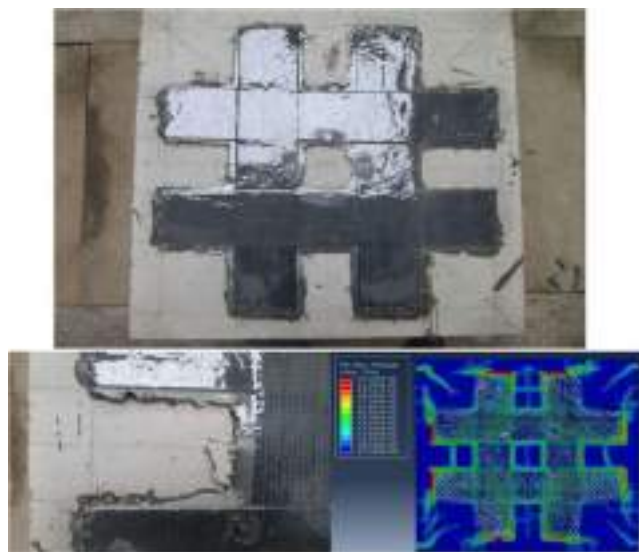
12 Concrete cracks in the tension surface of LFS.
